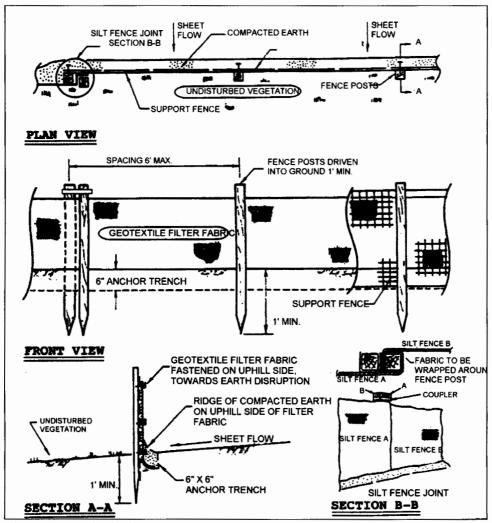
Typical Silt Fence Construction (Nebraska H2O n.d.)
